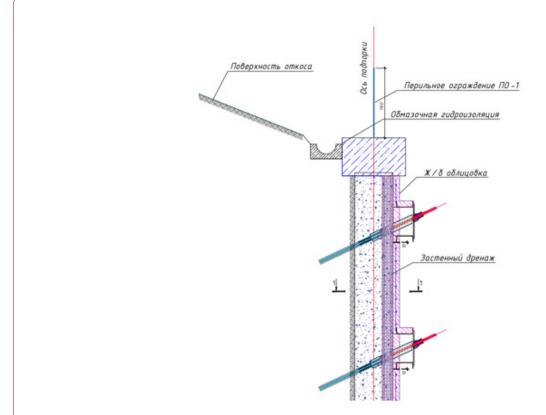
Attachment points of soil anchors of the upper and lower chords to the monolithic reinforced concrete corner retaining wall.
